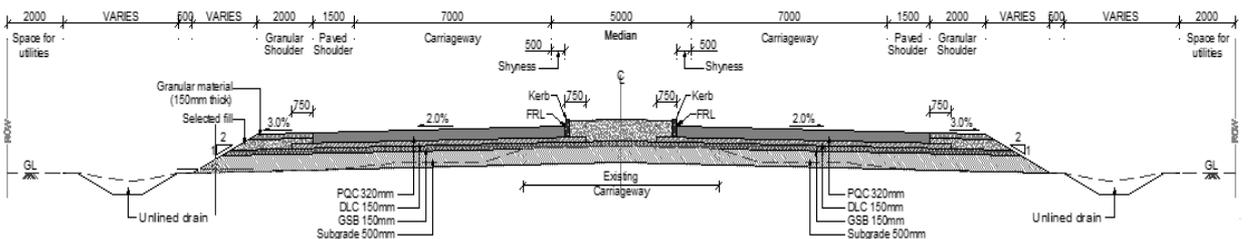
TCS 1B.1- 4 Lane Rural Area (Center Existing Road)
